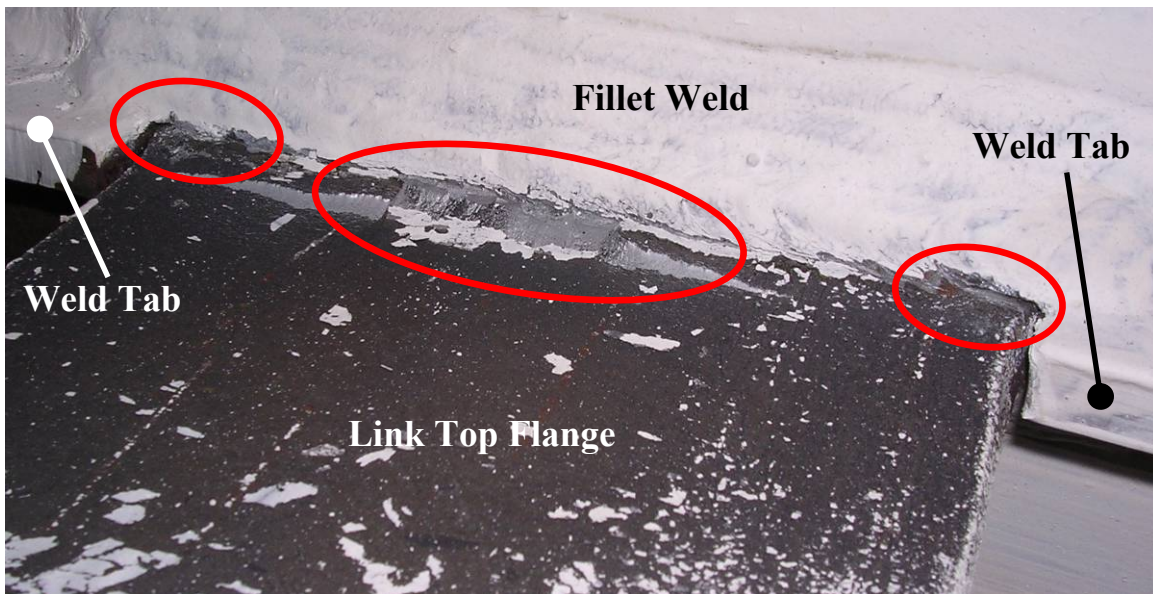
Link Flange Fracture in Specimen AISC-1
